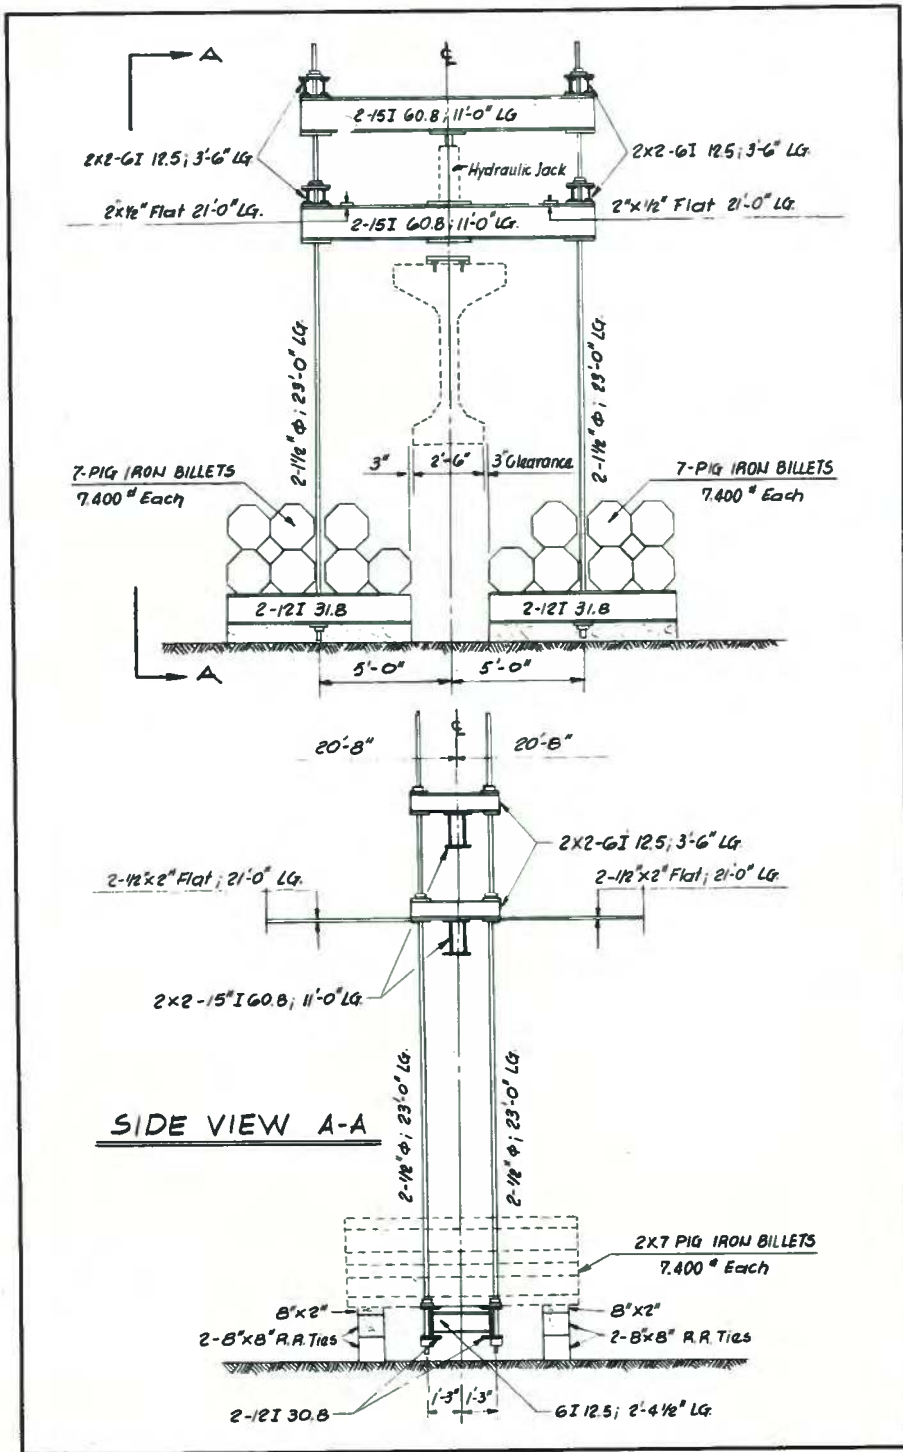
Elevation and section of typical jacking frame (for contrast see Fig. 10).
